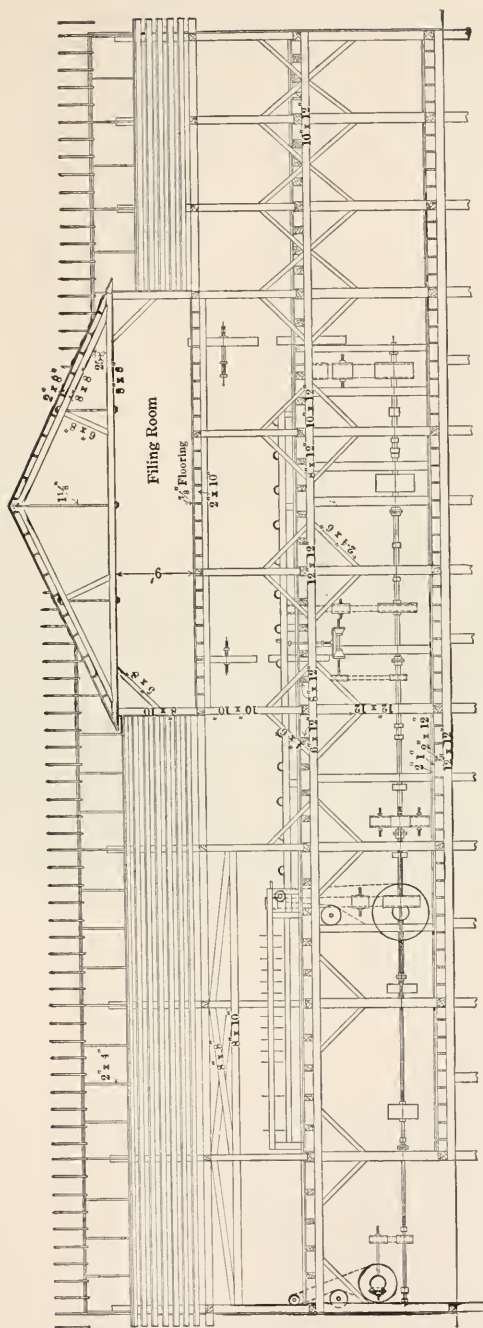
A Side Elevation of a Sawmill Building equipped with a Single-cutting Band Head-saw and a Vertical Resaw.
